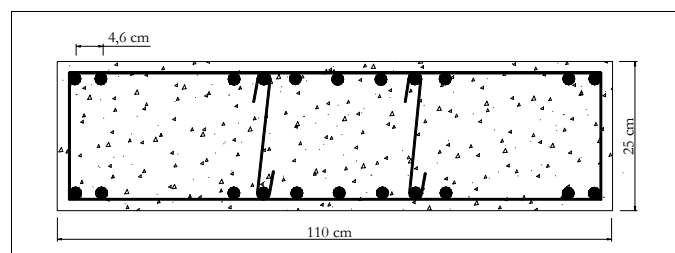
Case 4: Arrangement of reinforcement in cross section of column P1.
